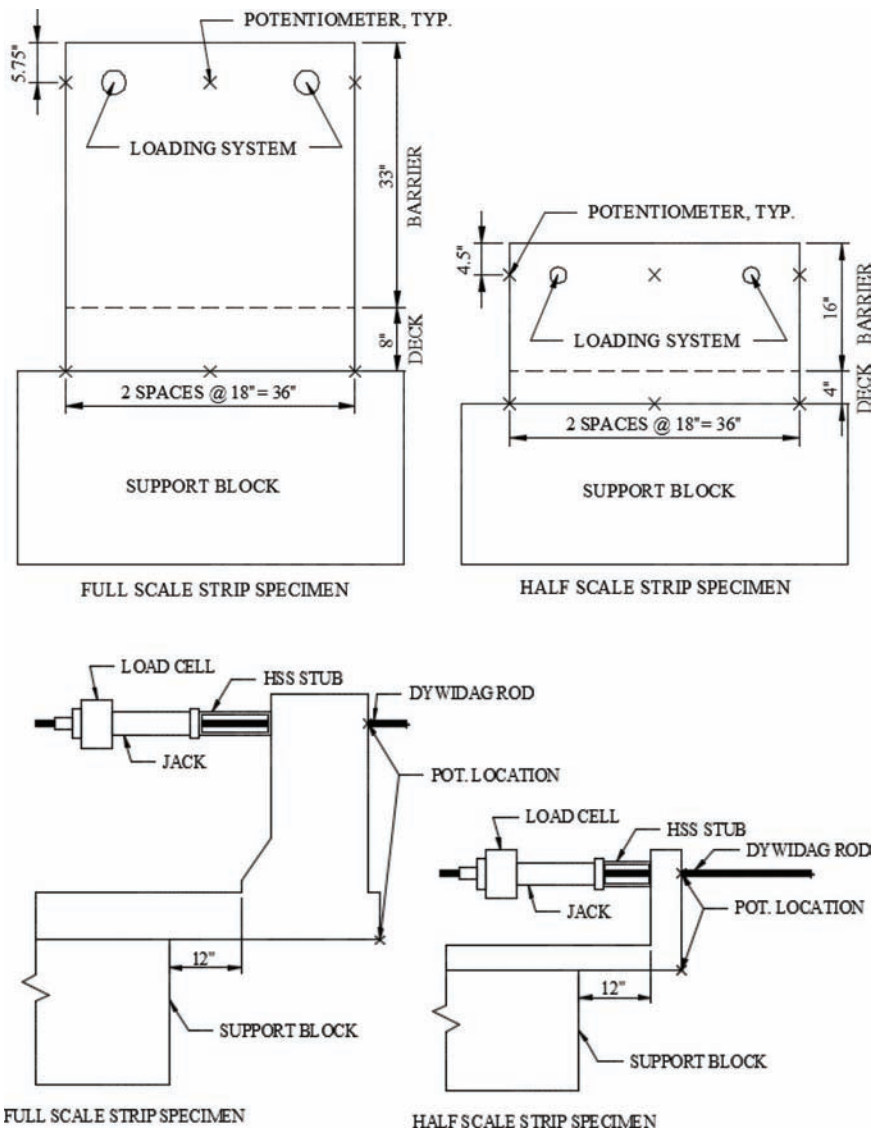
Strip specimen potentiometer locations (elevation view).
